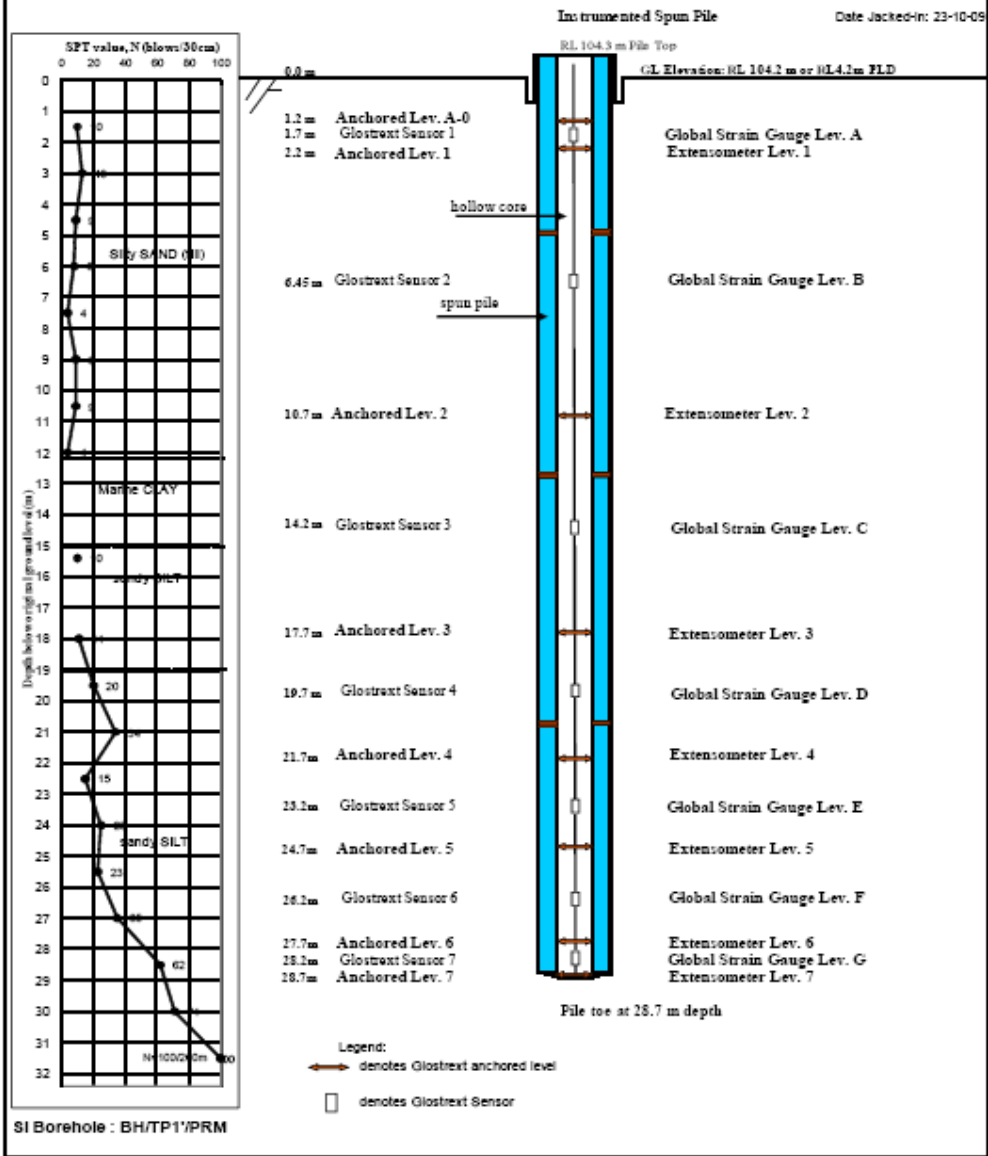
Instrumentation levels for Instrumented Test Pile TP1
